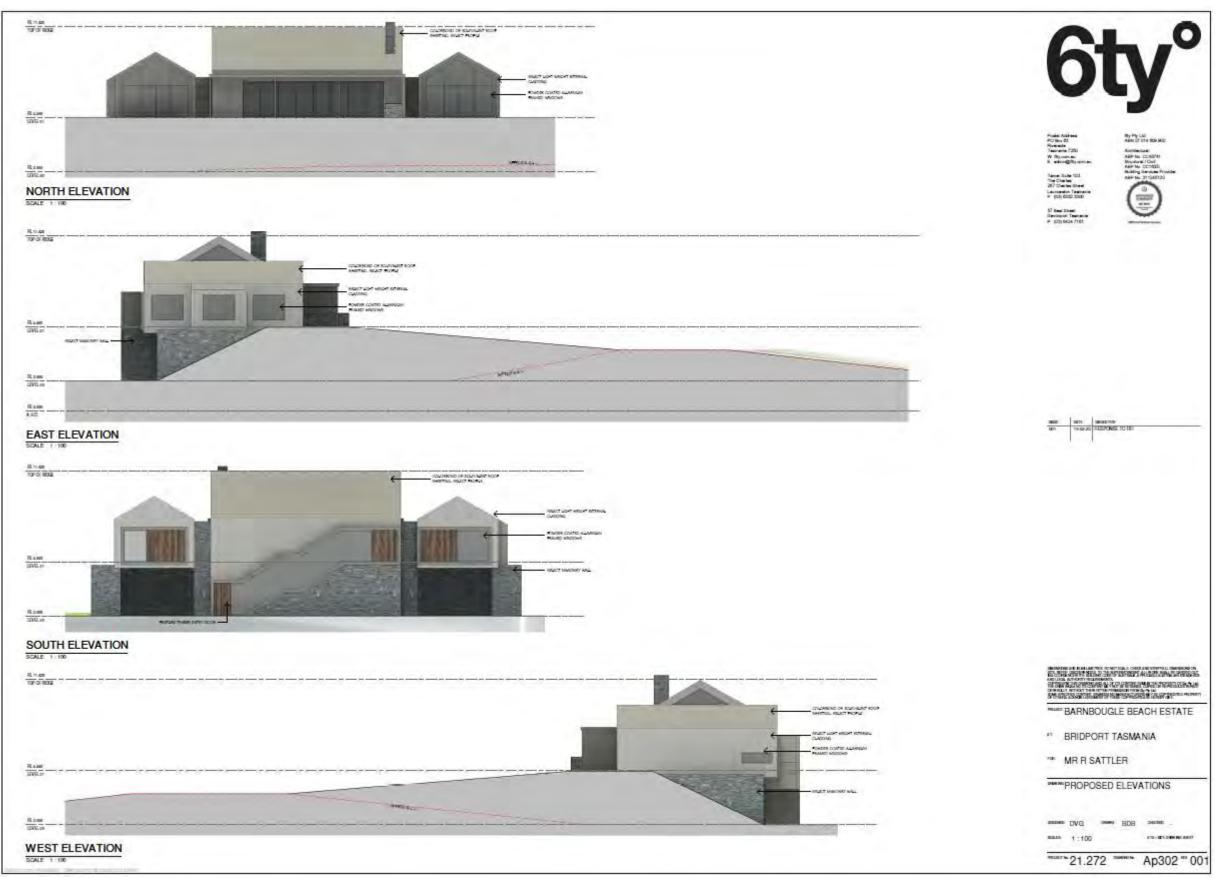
Elevations of proposed Unit 3 (source:6ty Degrees 2023)
